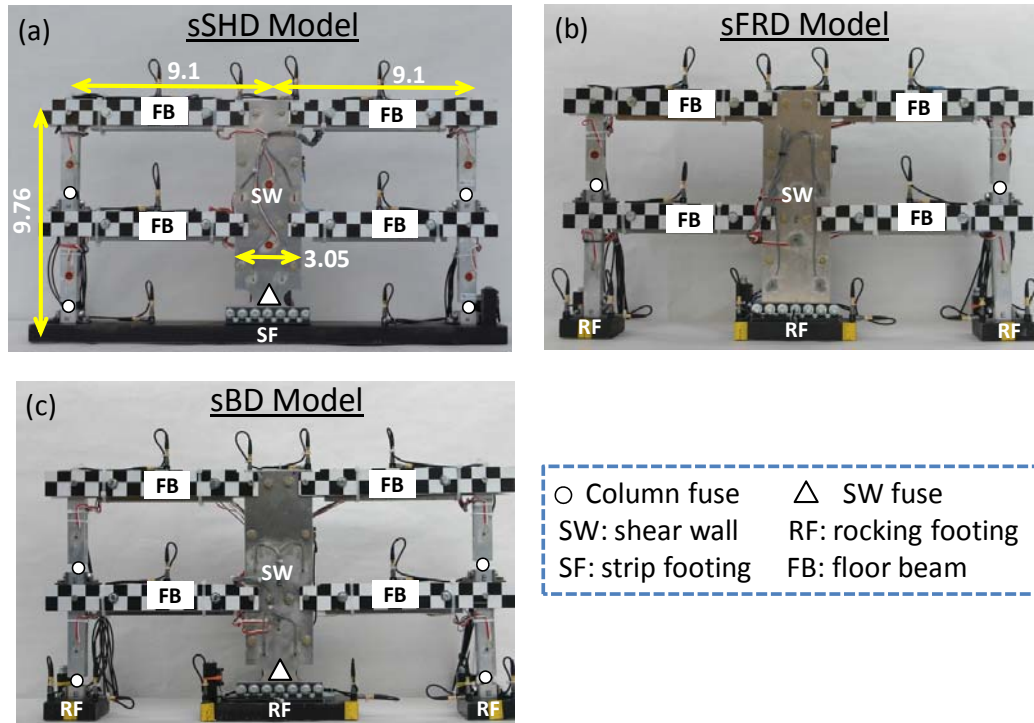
Constructed symmetric frame-wall-foundation models: (a) sSHD; (b) sFRD; (c) sBD (Dimensions in prototype scale, m)
